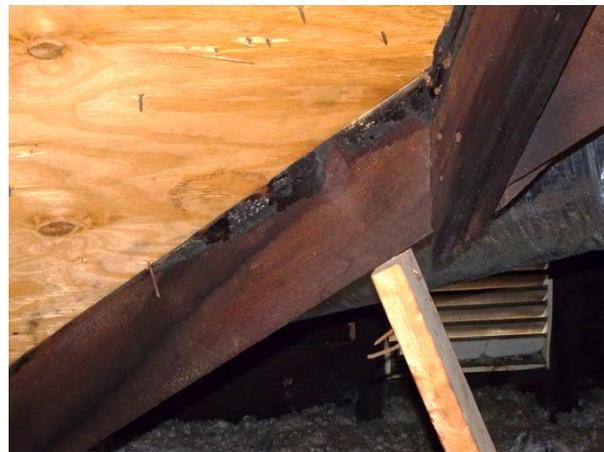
Wood roof rafter with evidence of previous fire damage.
